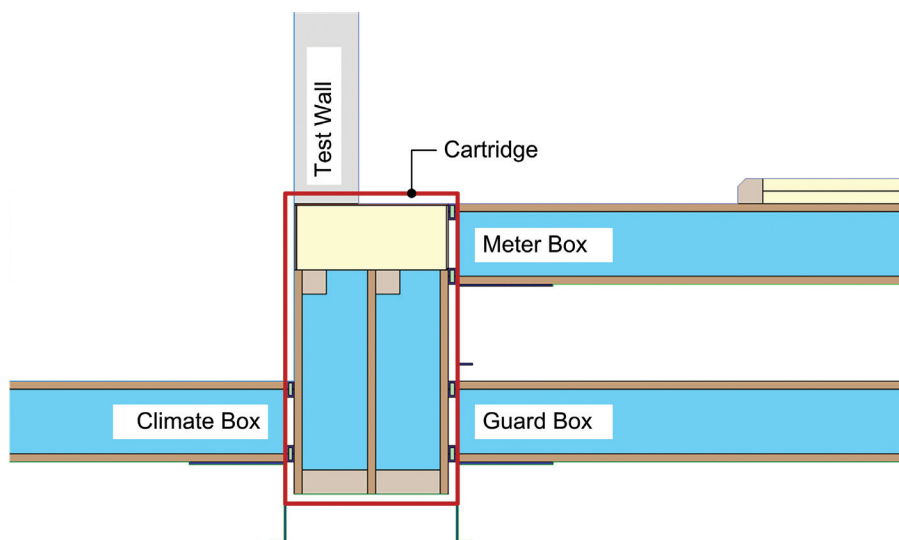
Section through wall cartridge showing relationship to meter box, guard box, and climate box.
